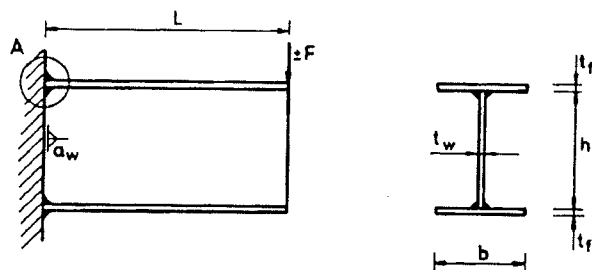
Welded I-section cantilever and the stress components in the connecting fillet welds
